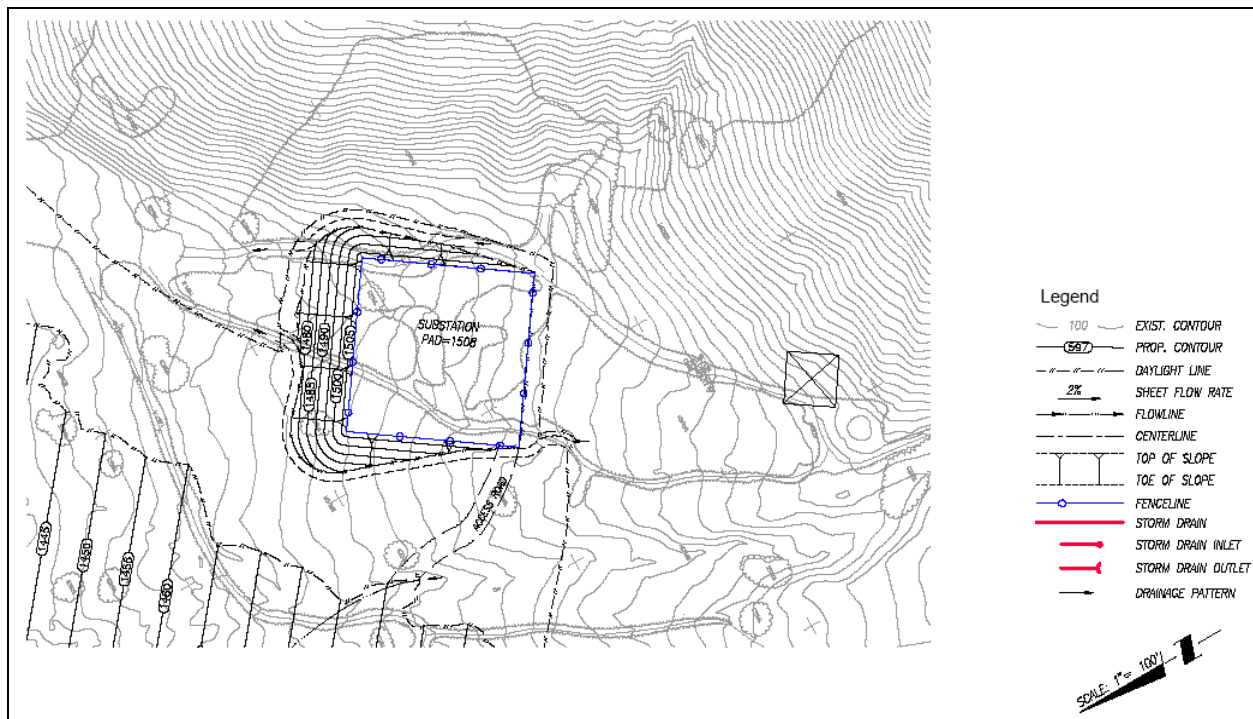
Lake Switchyard Grading Plan
